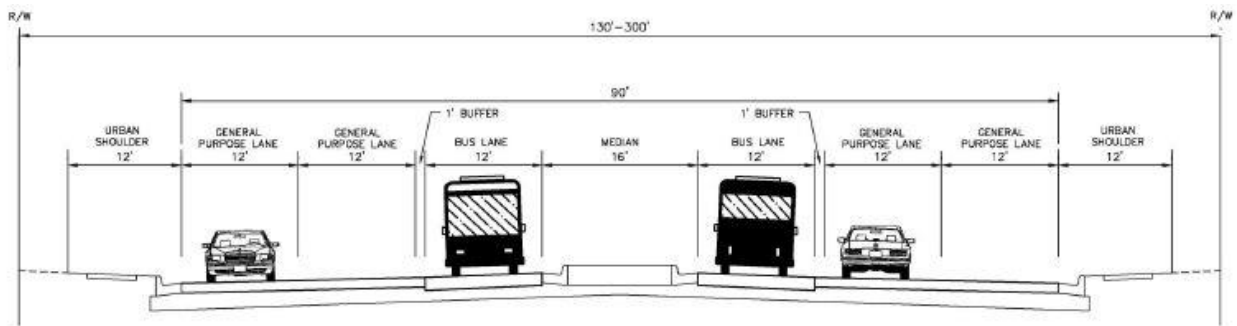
Proposed Typical Section on Cobb Parkway -- Center-Running Dedicated Guideway
